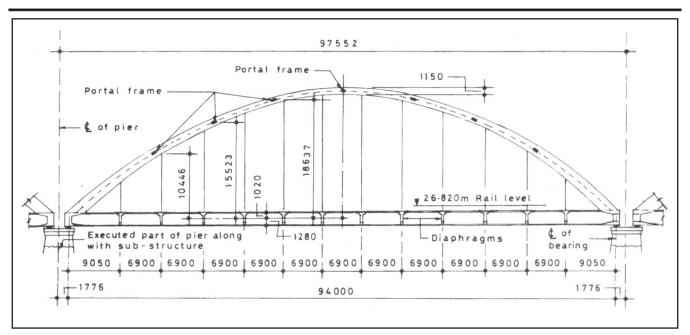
Longitudinal section of a typical bow-string arch superstructure
